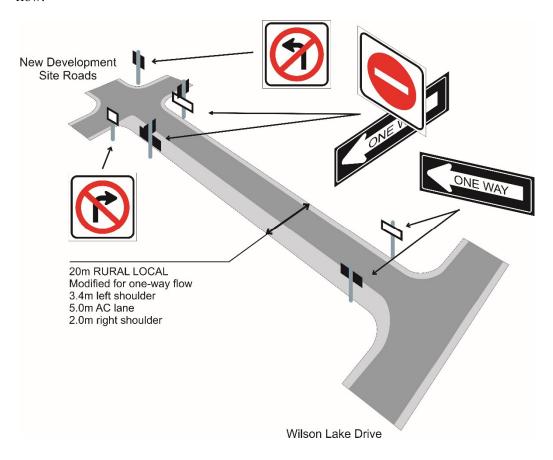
Proposed Layout of One-way Connection to Wilson Lake Drive
